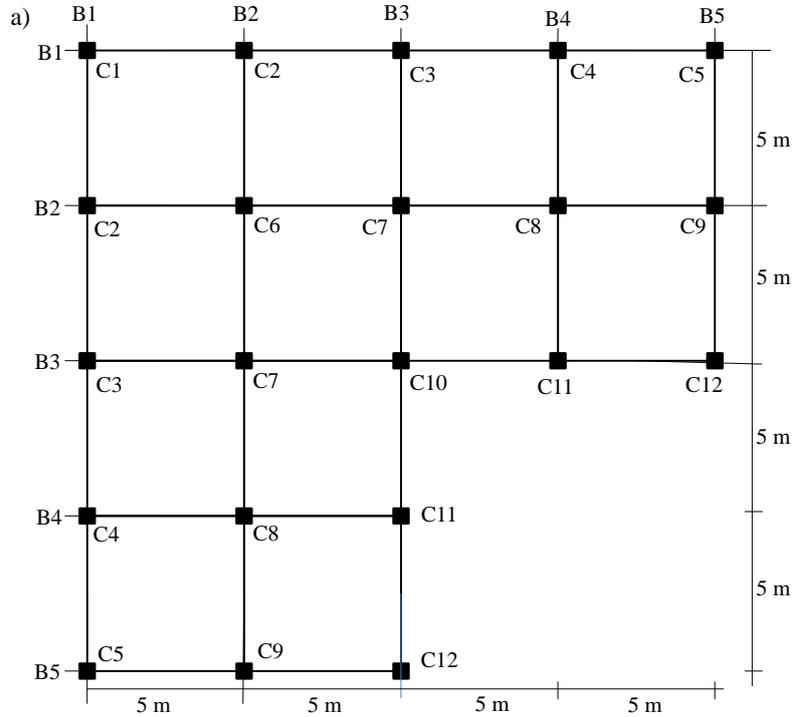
Typical floor grid plan of the building frame showing beams and column positions a) L shaped building
